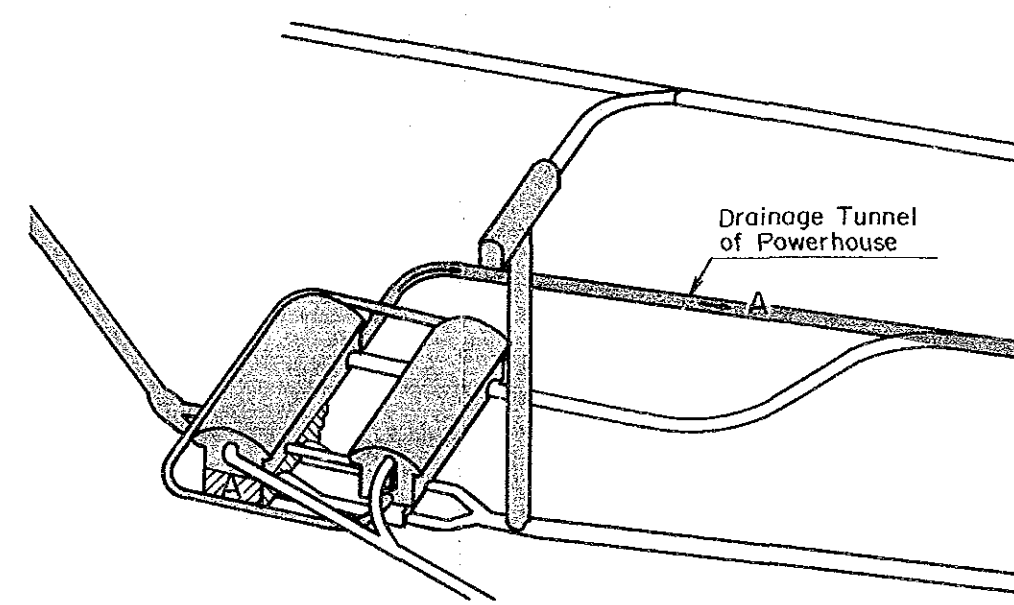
Construction Procedure Surrounding Powerhouse
